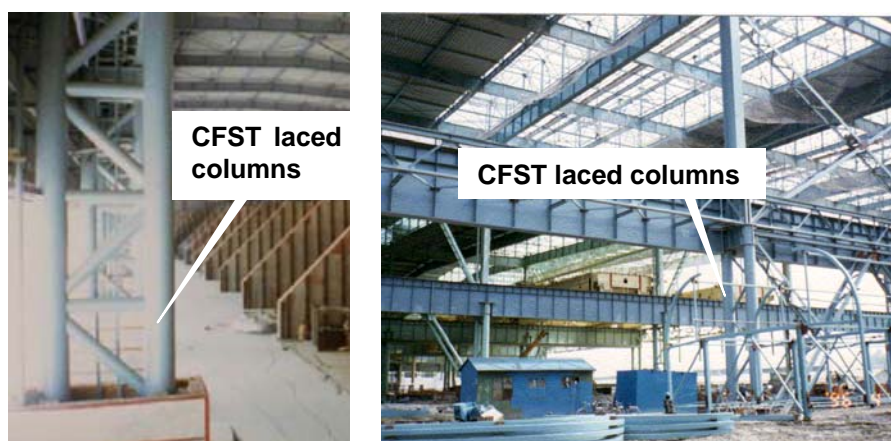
CFST laced columns used in real constructions (Han 2007)
